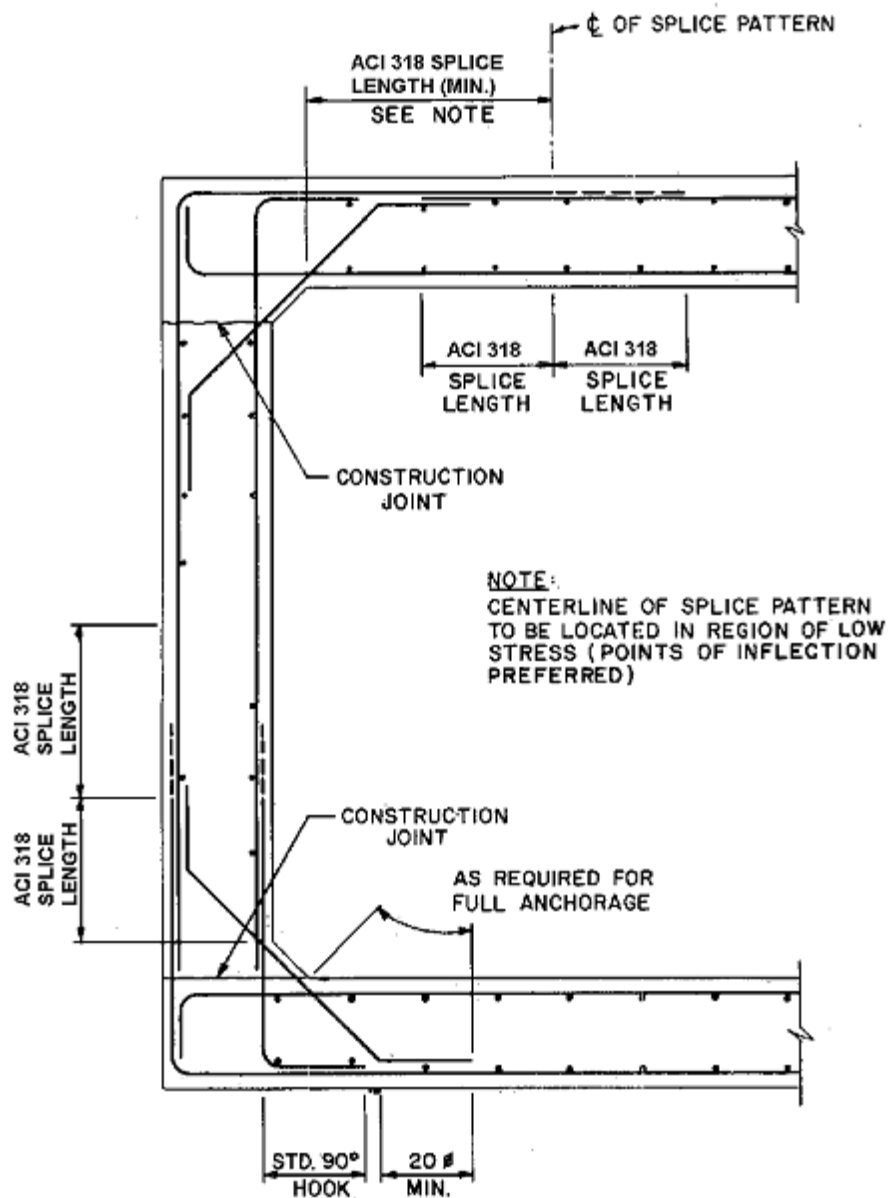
Typical Section Through Conventionally Reinforced Concrete Wall
